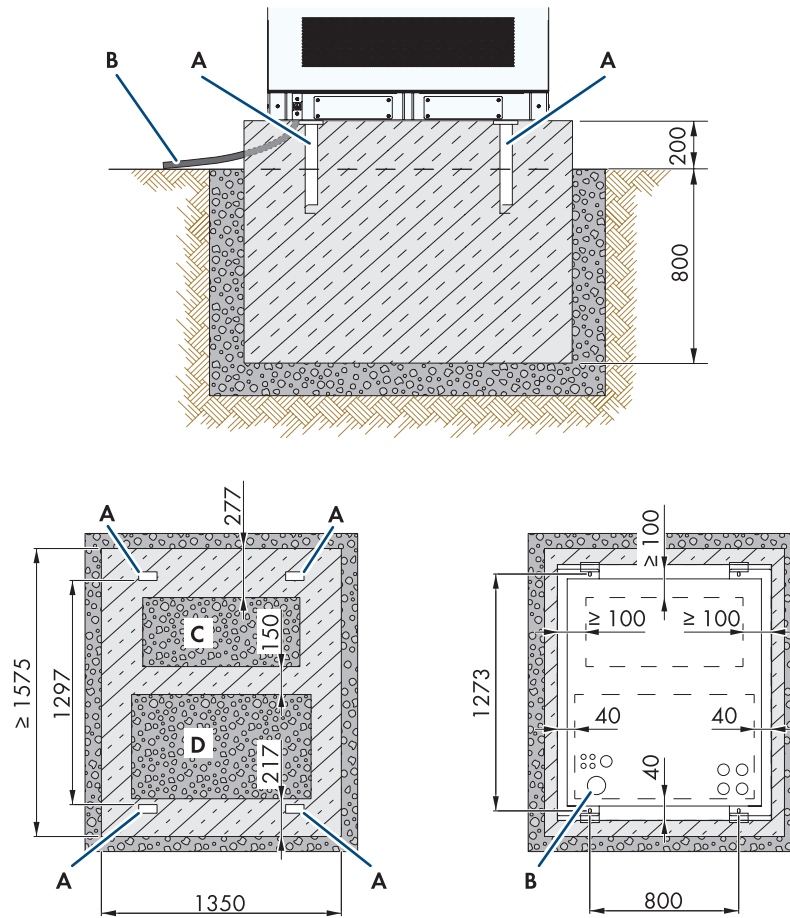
Design of the foundation for the outdoor version: The top figure shows a cross-section from the front; the bottom figure shows a top view of the foundation with and without the battery cabinet (dimensions in mm)
